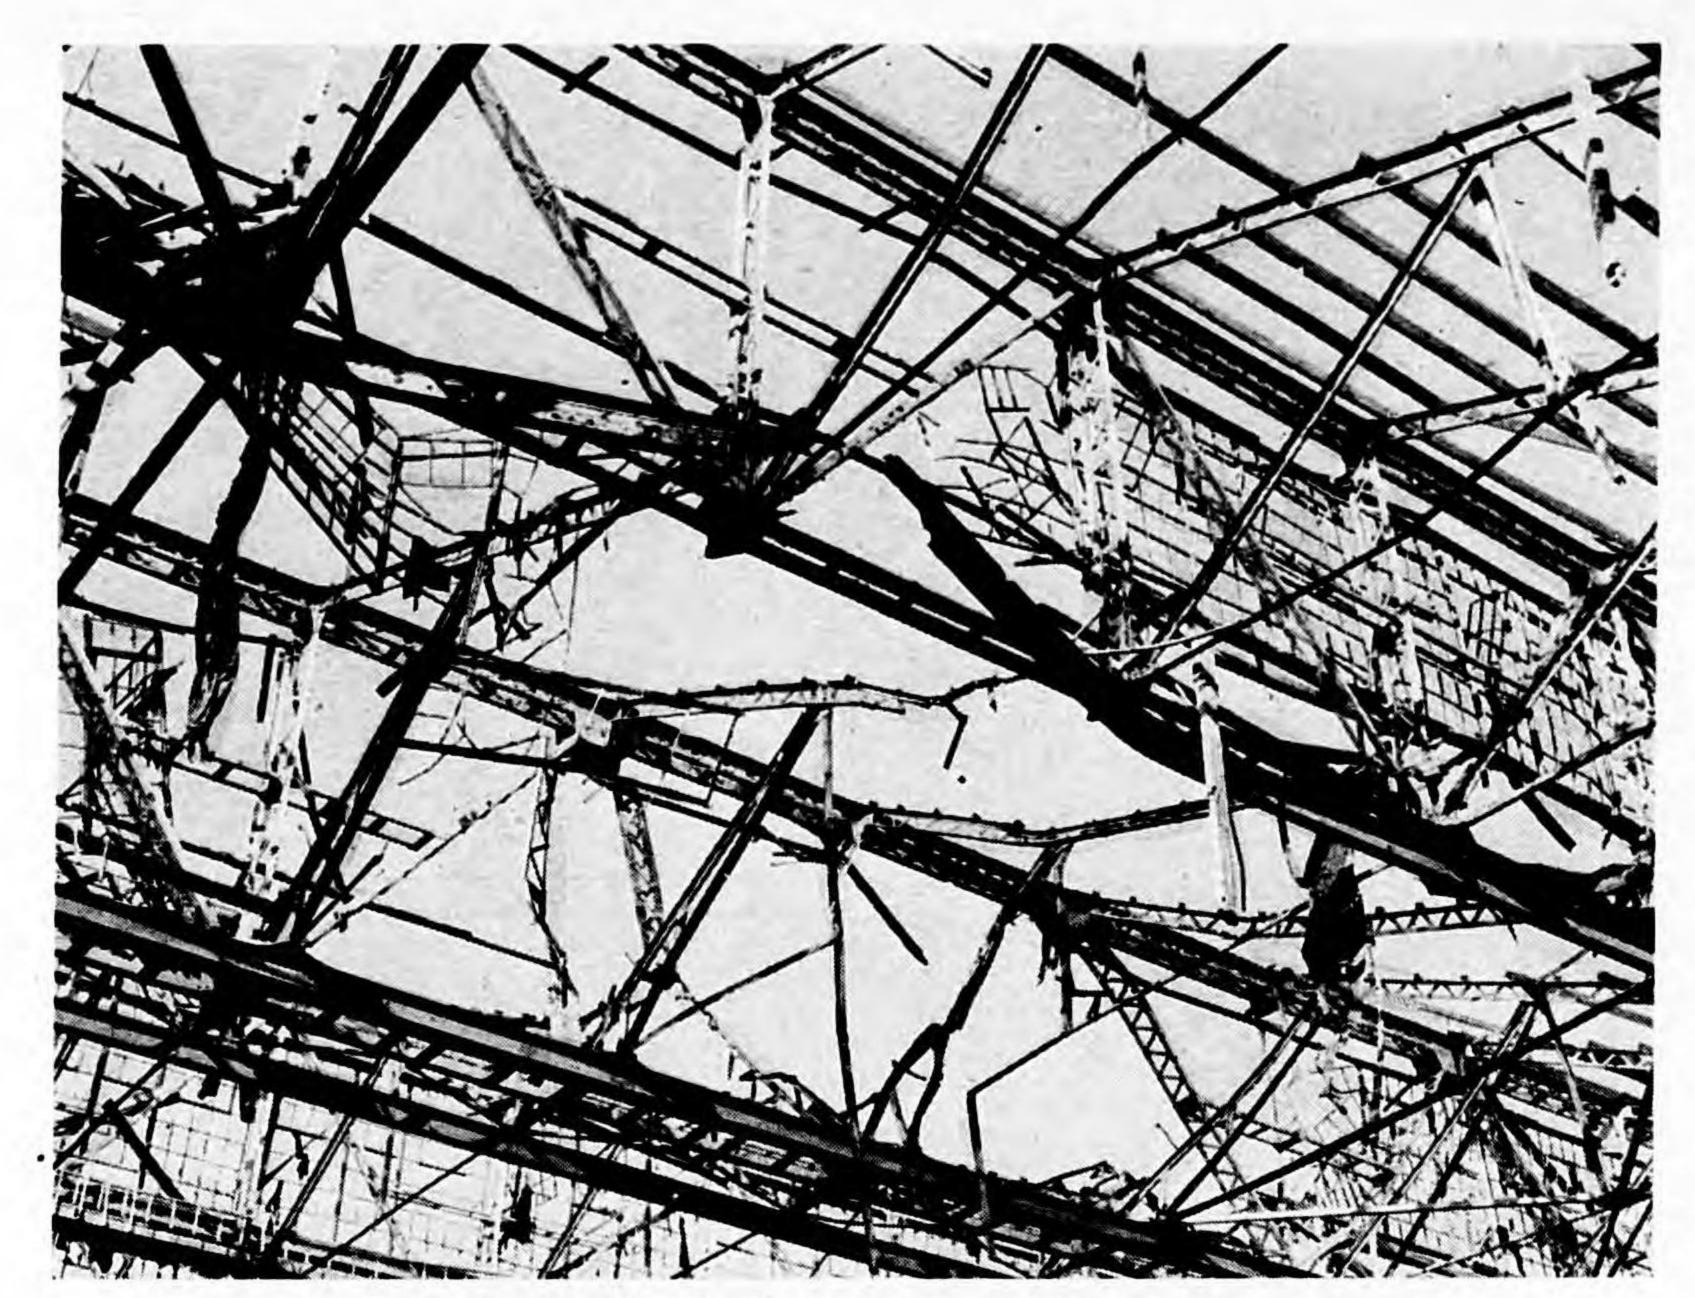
Building 1, Bomb 2; damaged roof steel.
